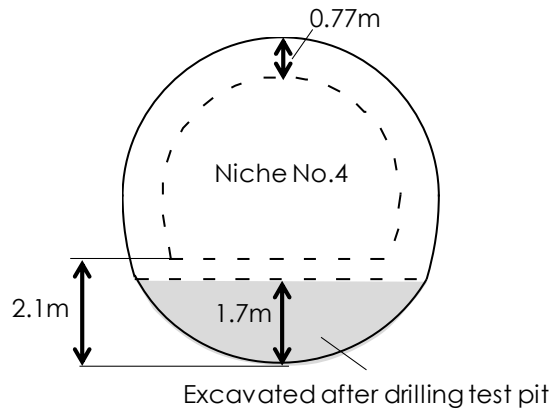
Shape of concrete-type plug (A-A cross section in Fig. 10)
